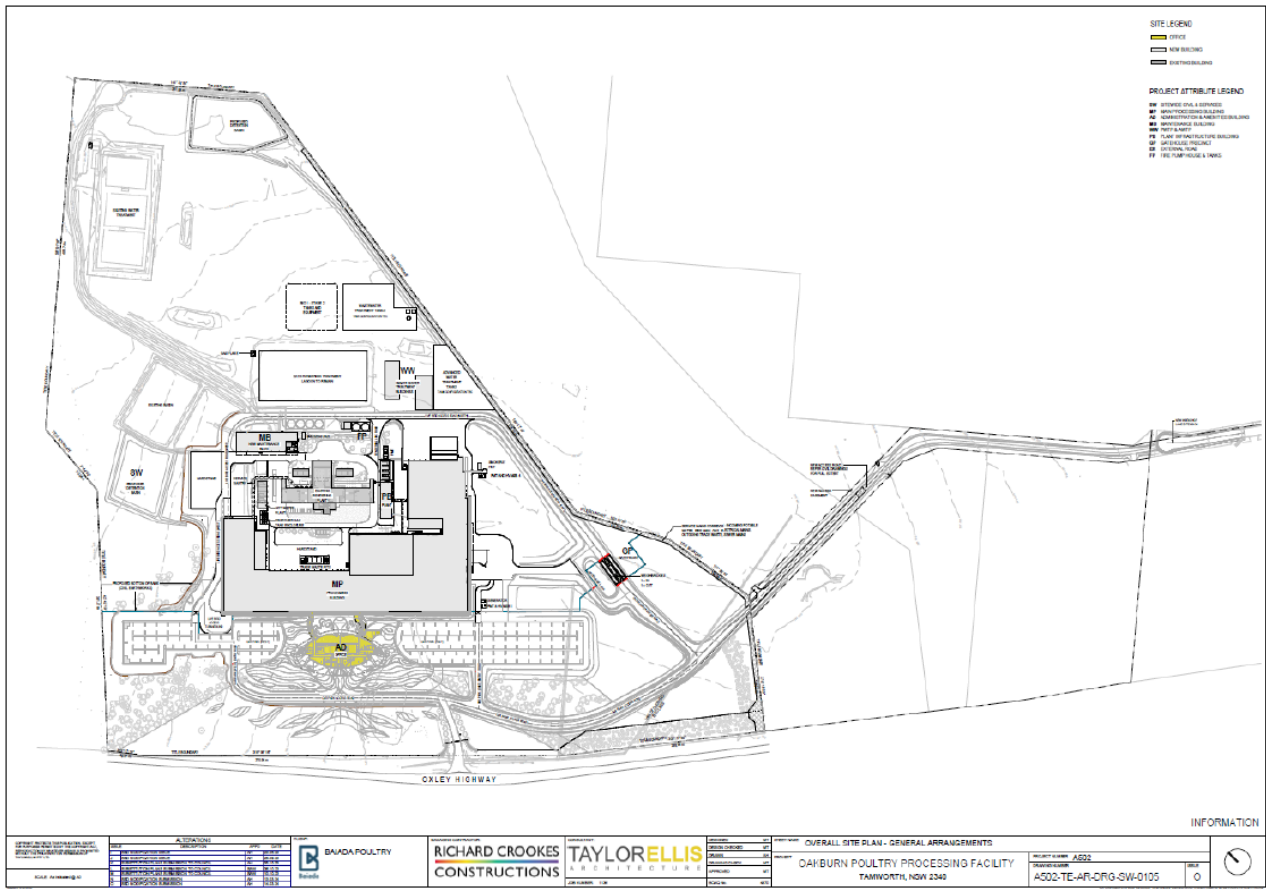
Approved Site Plan (SSD-9394-MOD-1)
